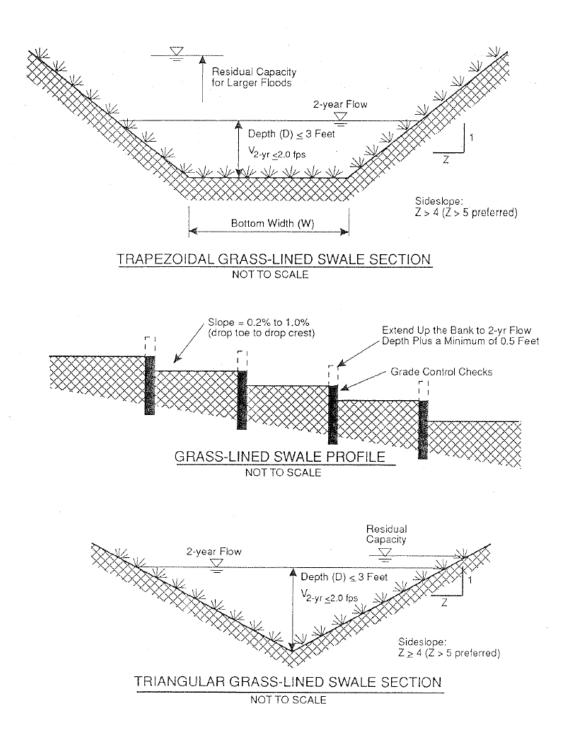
Profile and Sections of a Grassed-Lined Swale
